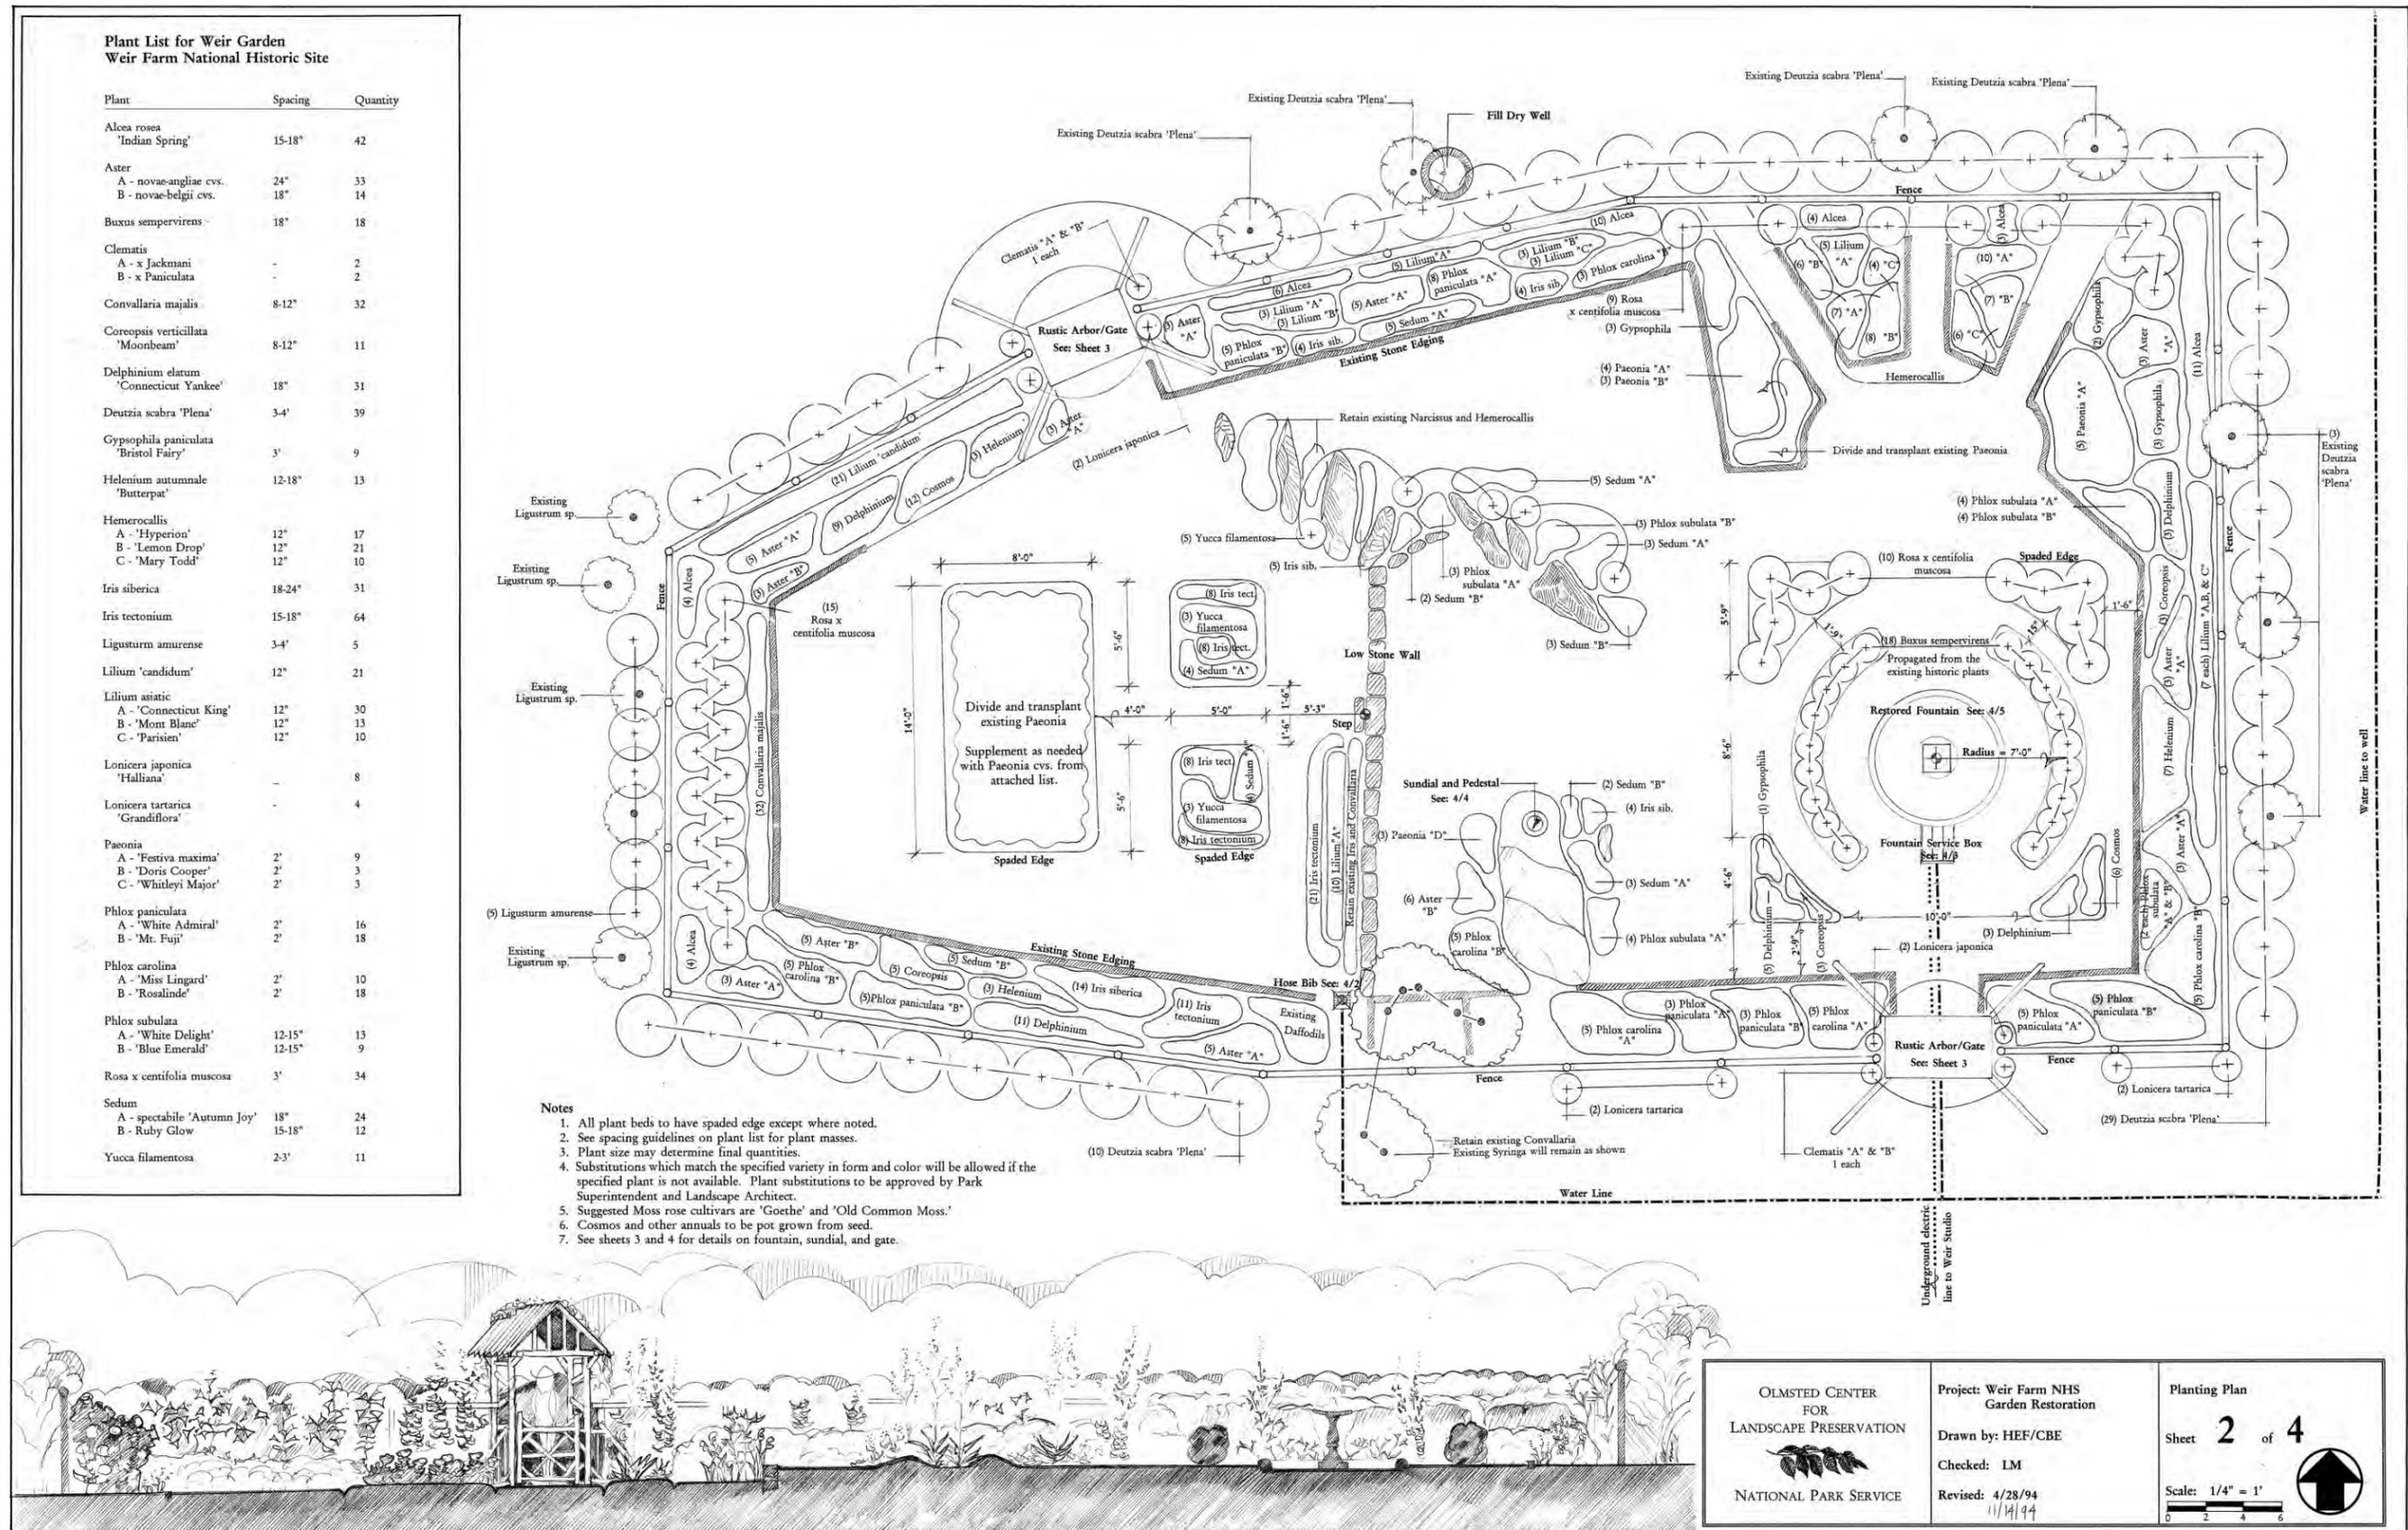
Secret Garden Planting Plan, 1994 (OCLP).
